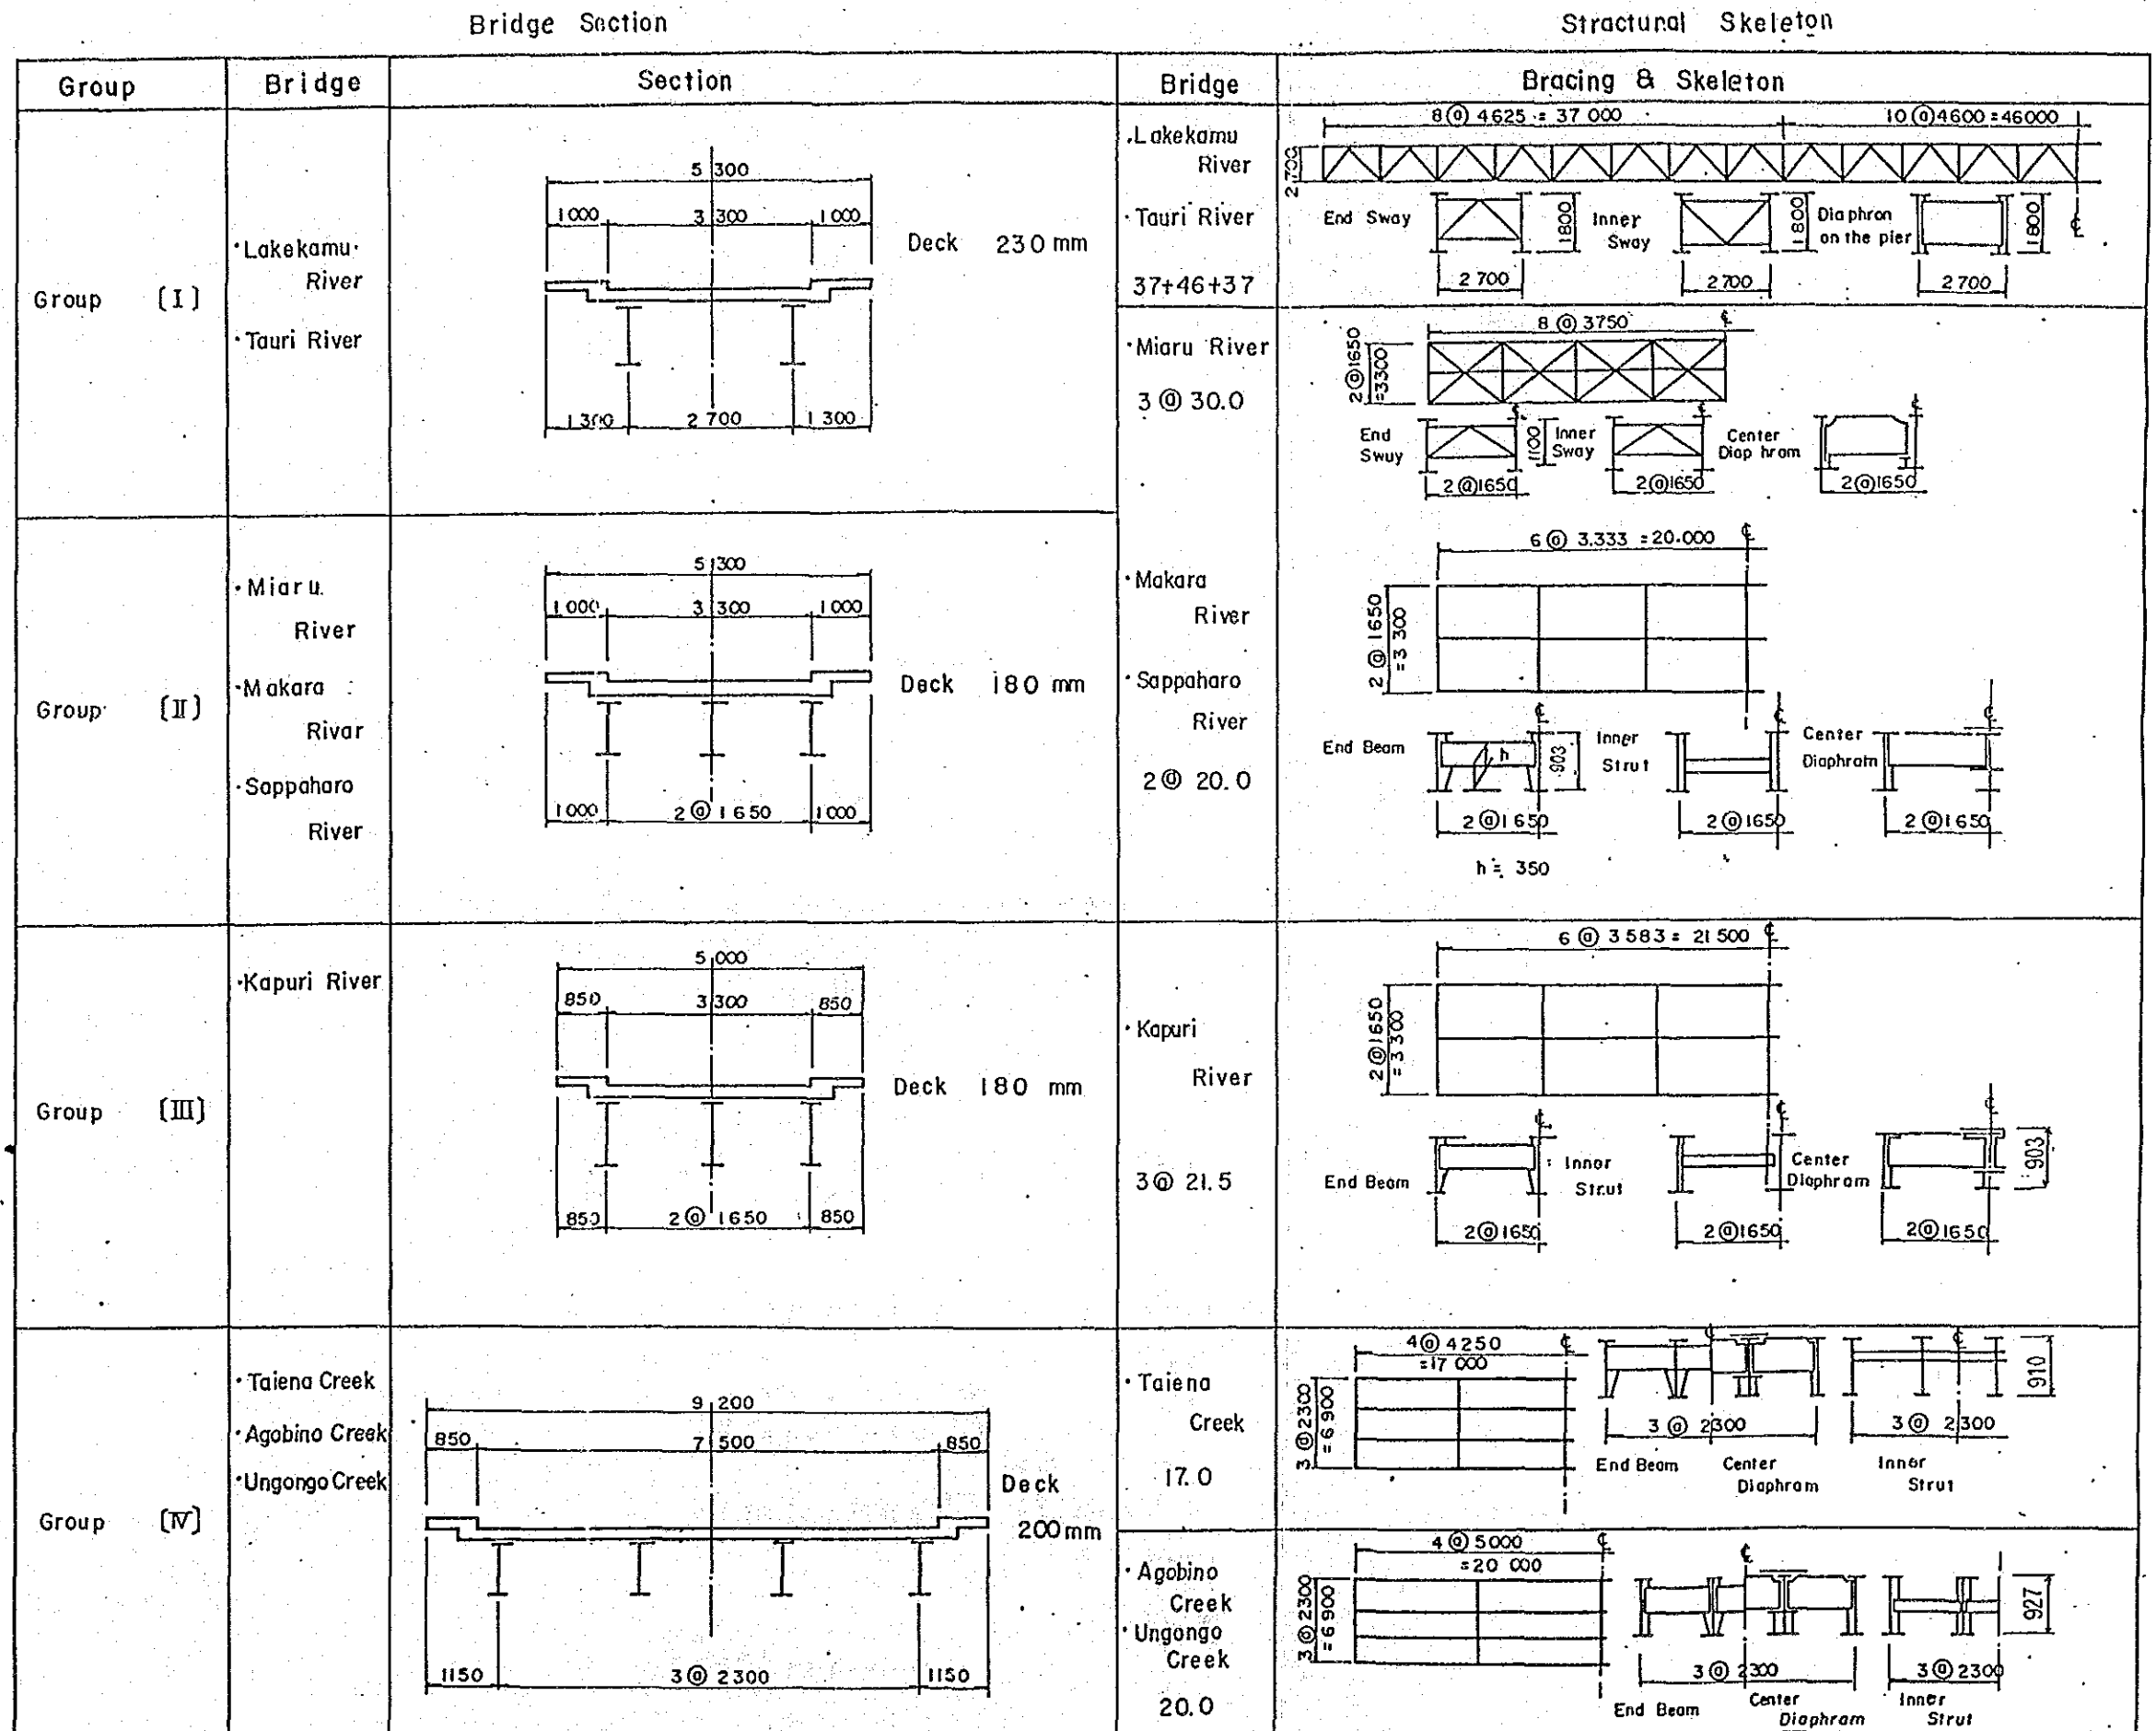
DETAILS OF PLATE GIRDER BRIDGE
